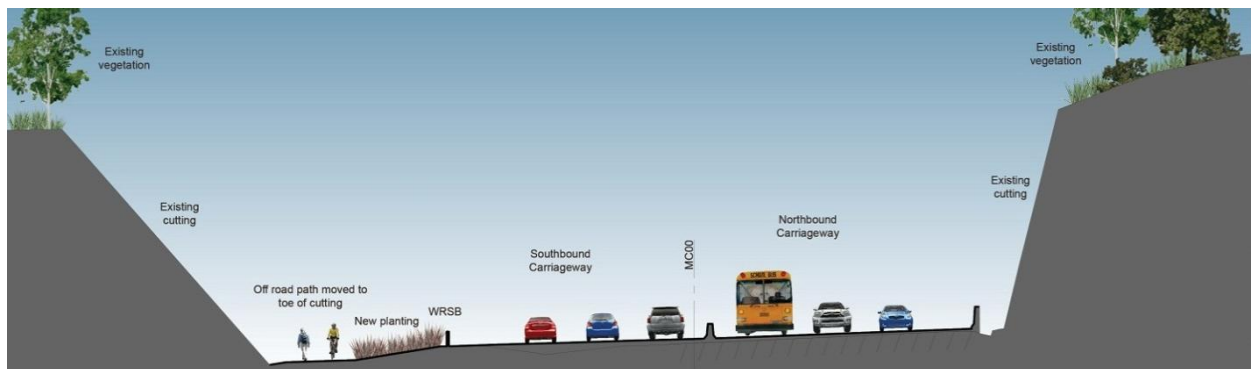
Indicative road cross section 600 metres south of Alfords Point Bridge
